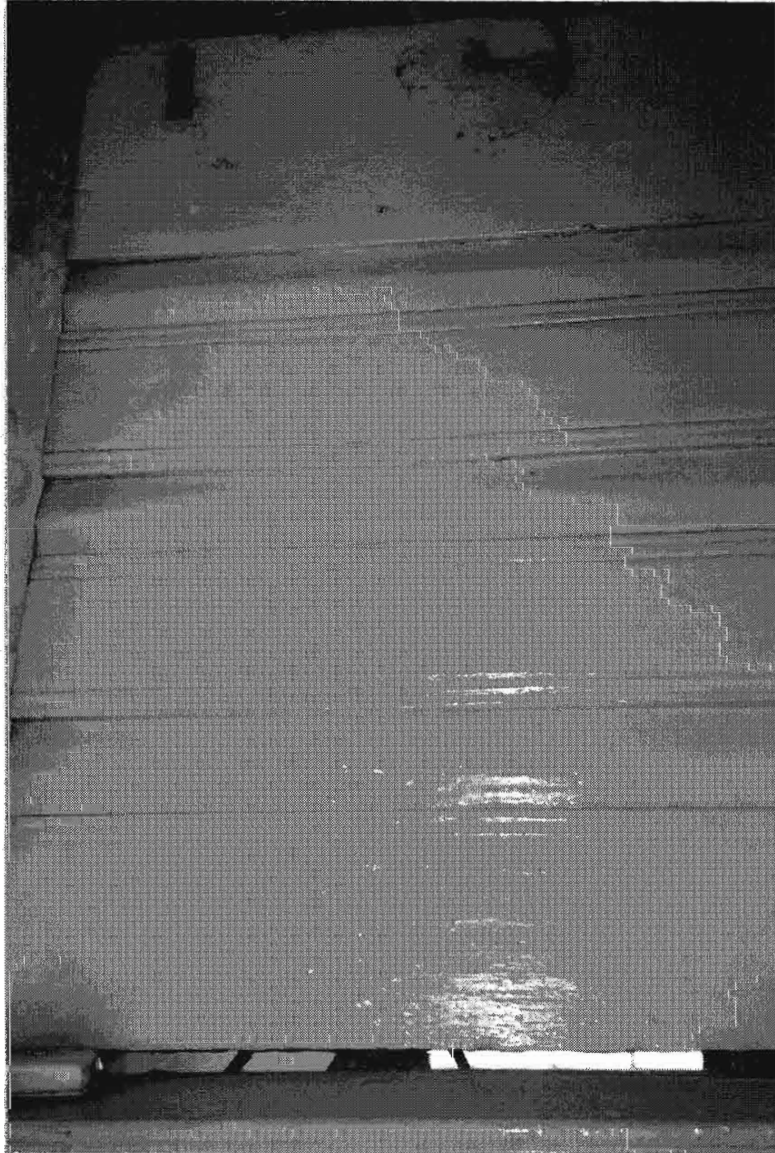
Detail of door face at G 4, showing both the moulded plank edges and cambered insert sections with plain, plank lock stile.
